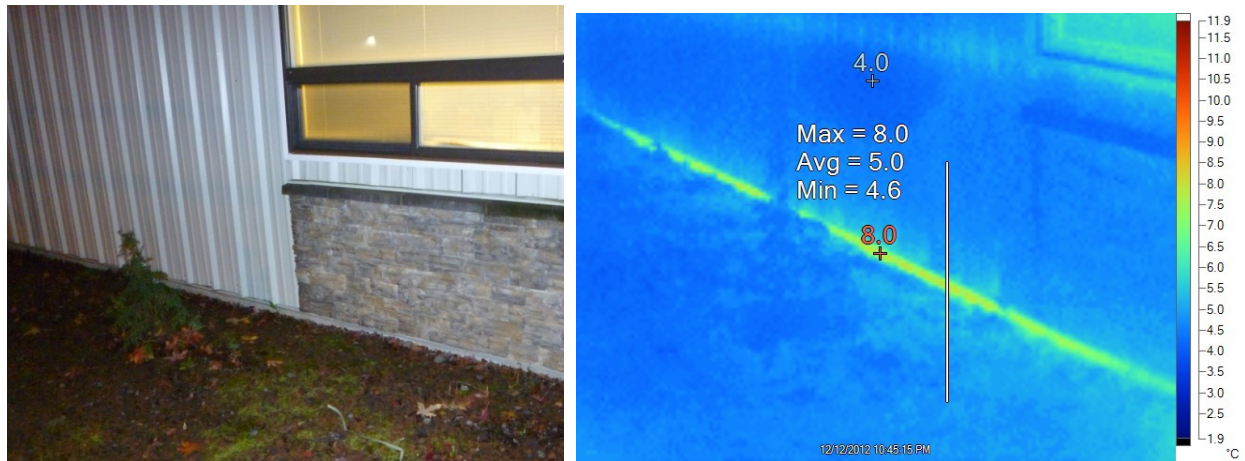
Thermal and photo images of north exterior wall of Office at slab
